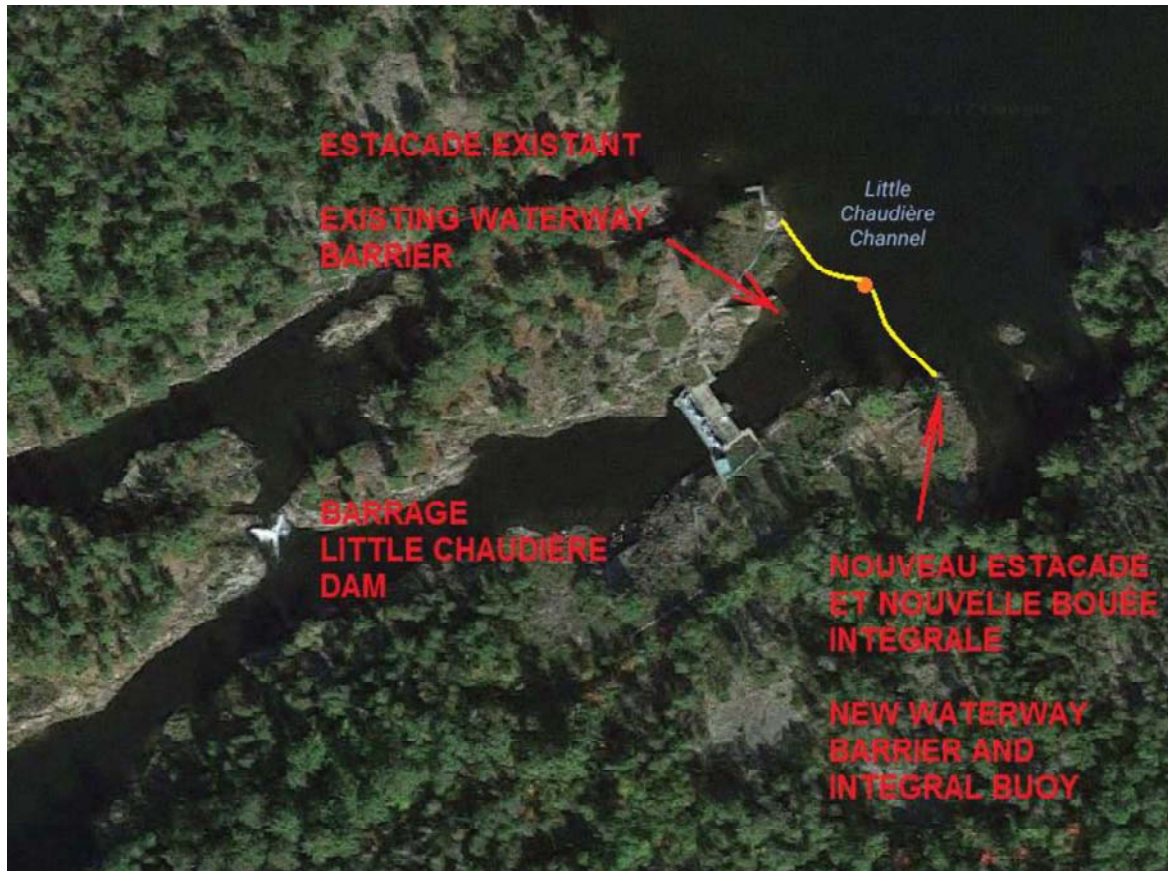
Little Chaudière Dam showing existing waterway barrier and approximate new location of waterway barrier with integral hazard buoy.
